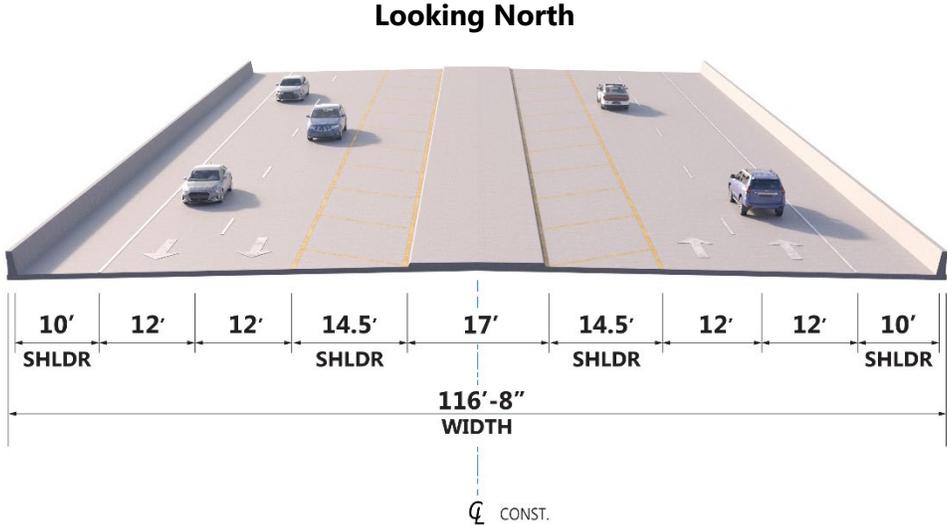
Proposed US 41 over SR 54 Bridge Typical Section
